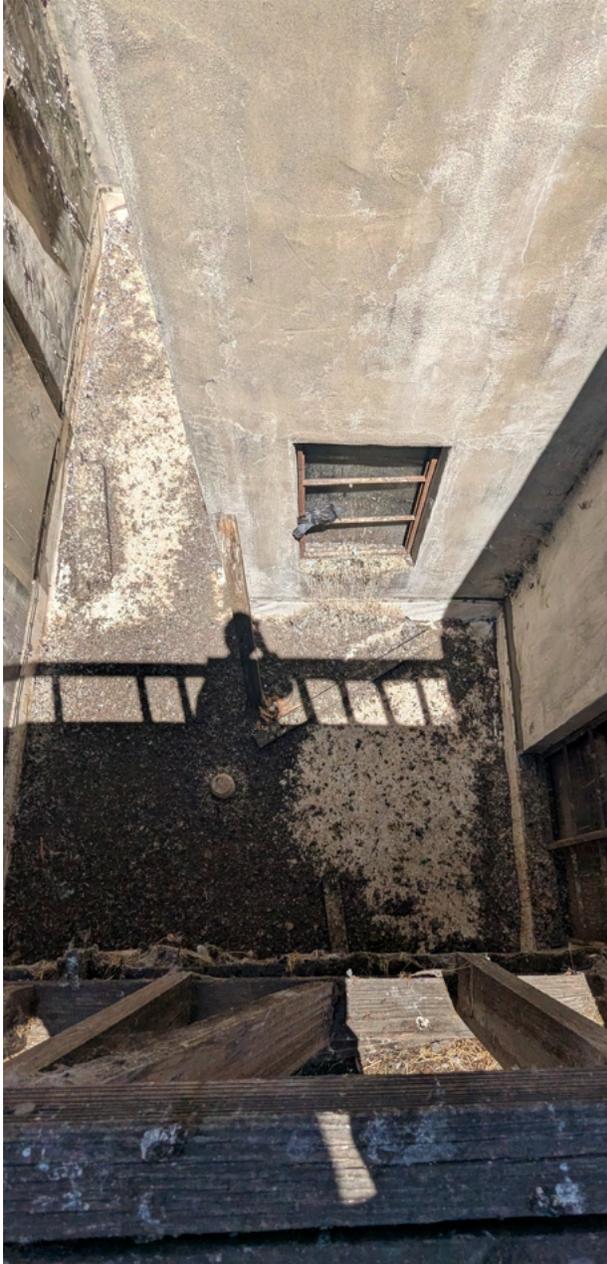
(Left) The lightwell at the rear of the building houses nesting pigeons, TEF, 2025.
